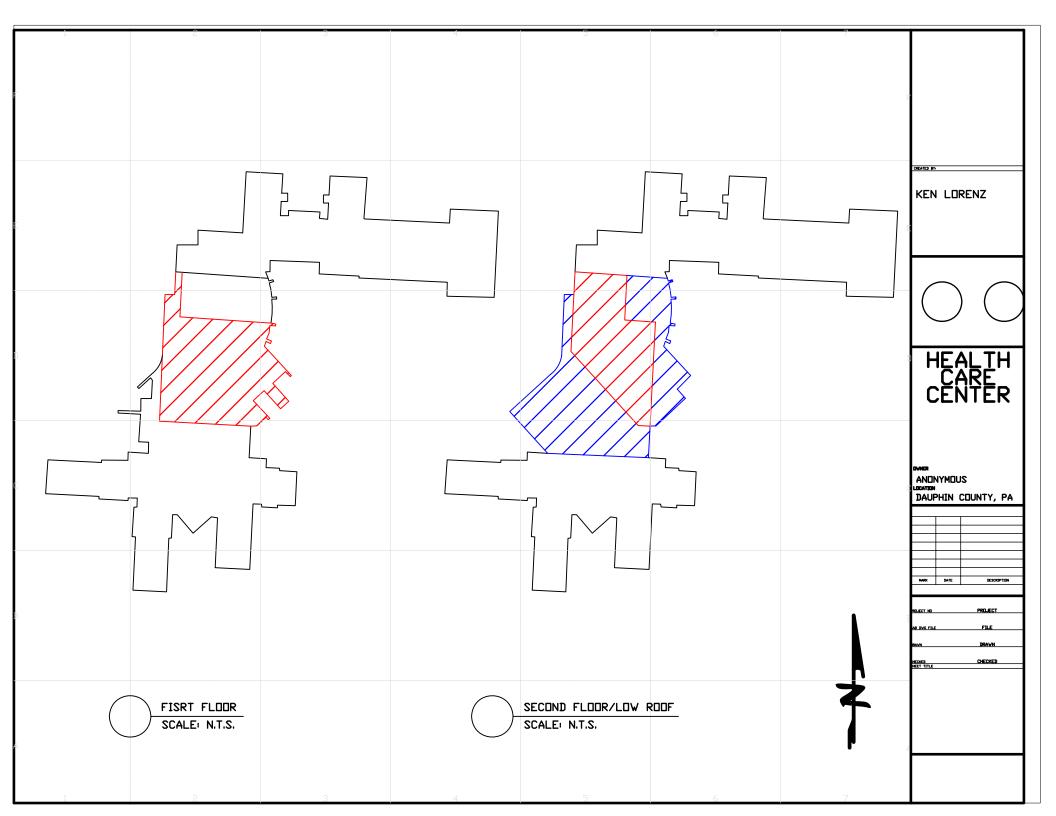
DETAILED STRUCTURAL ESTIMATE Second Floor / Low Roof
